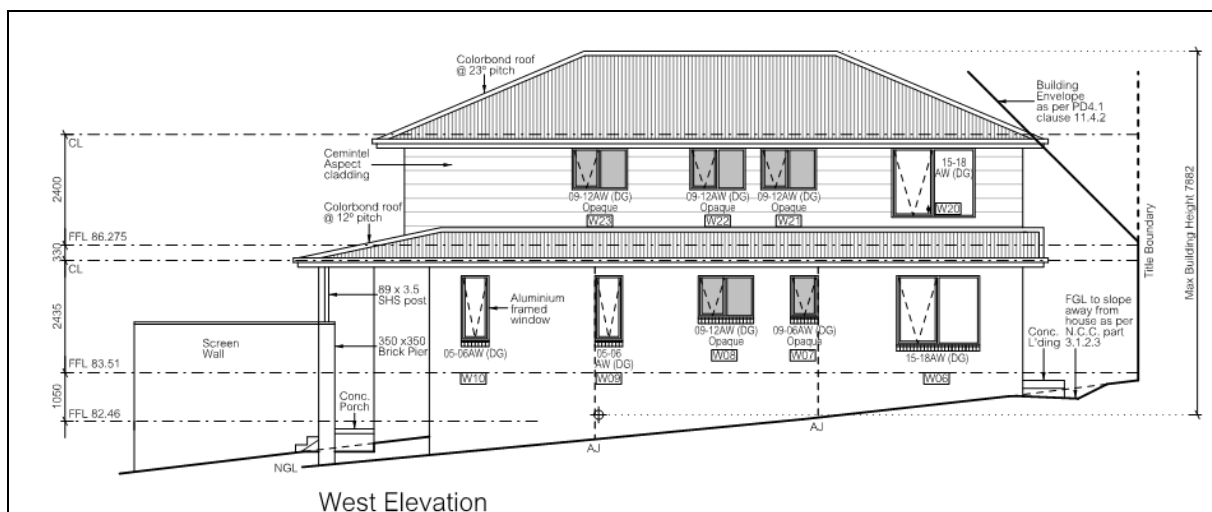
Proposed west elevation, facing 5 and 7 Carlton Street.
